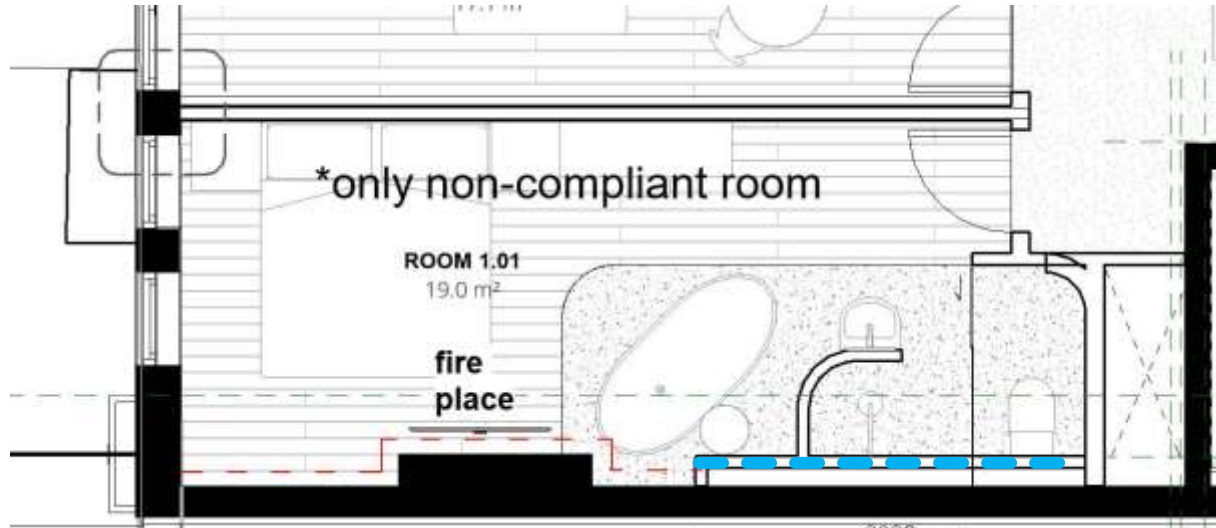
Possible Location of Acoustic Wall Option B – Room 1.01 - Elevation
